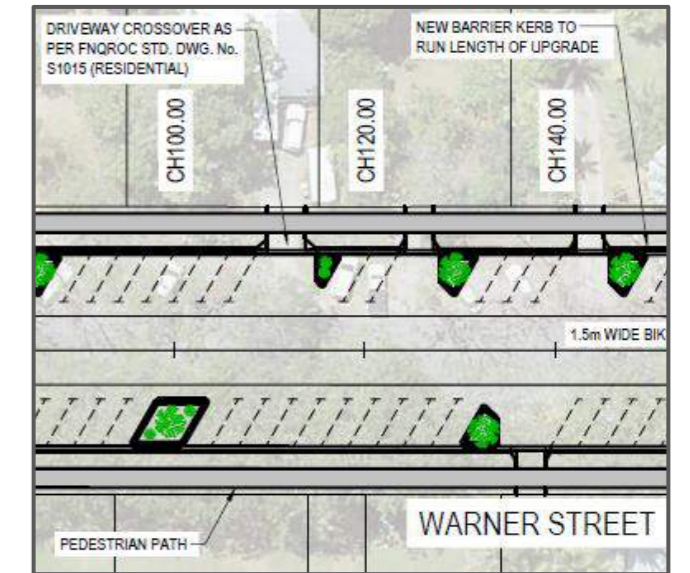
b: Snapshot from Drawing Q184018-001-CI-2001 showing Stage 2 of proposed works. Refer to Page 16a & 16b for plan and sections.
